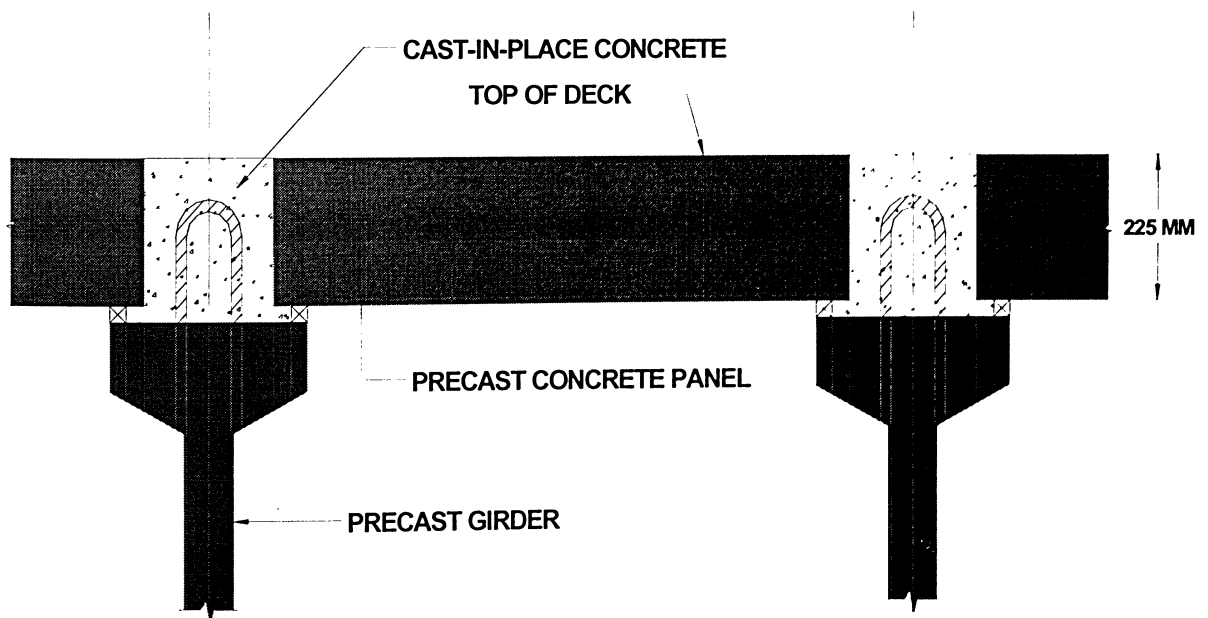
Full-depth Prefabricated Bridge Deck Panels System
